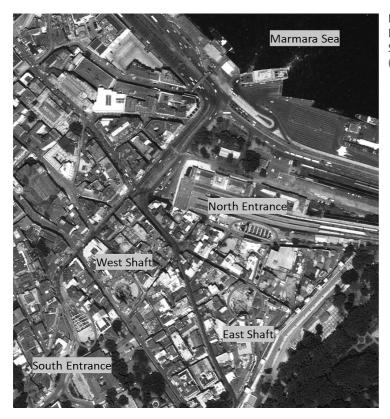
Excavation area in Sirkeci Station overview (Gür-Düzgün and Emre 2018, 31).
